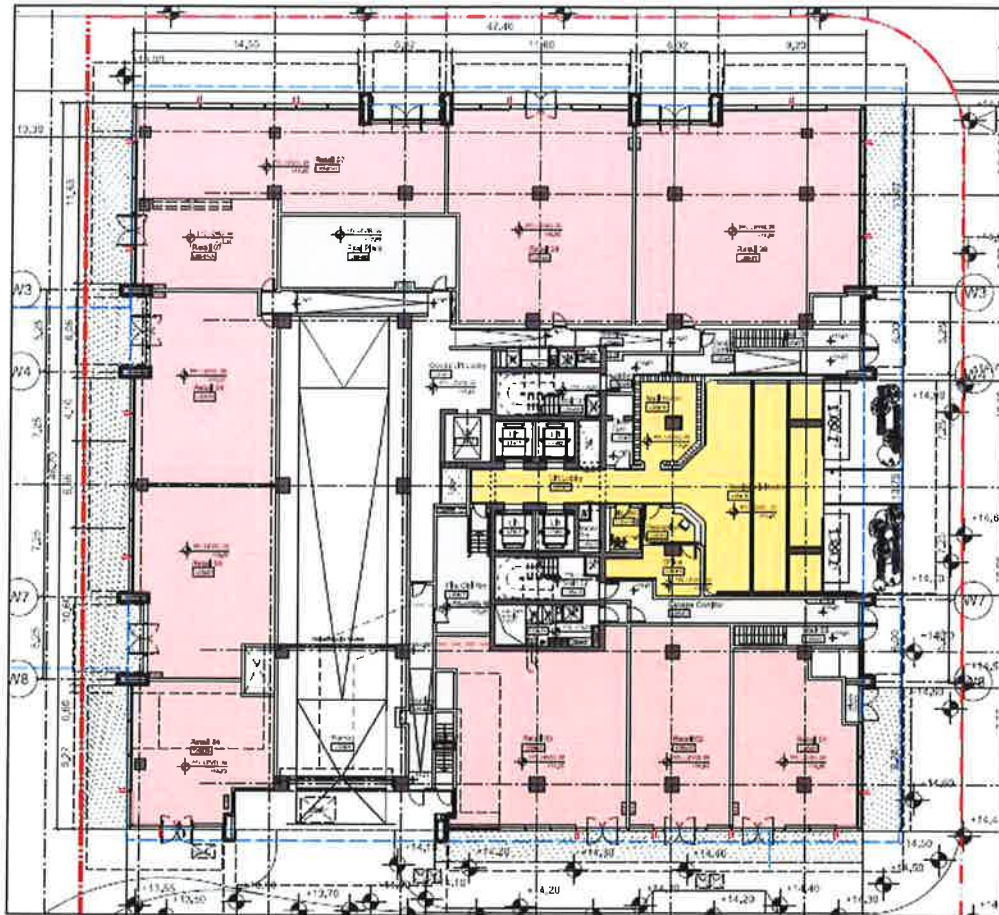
Approved layout of Ground floor (source: Approved Plans)
